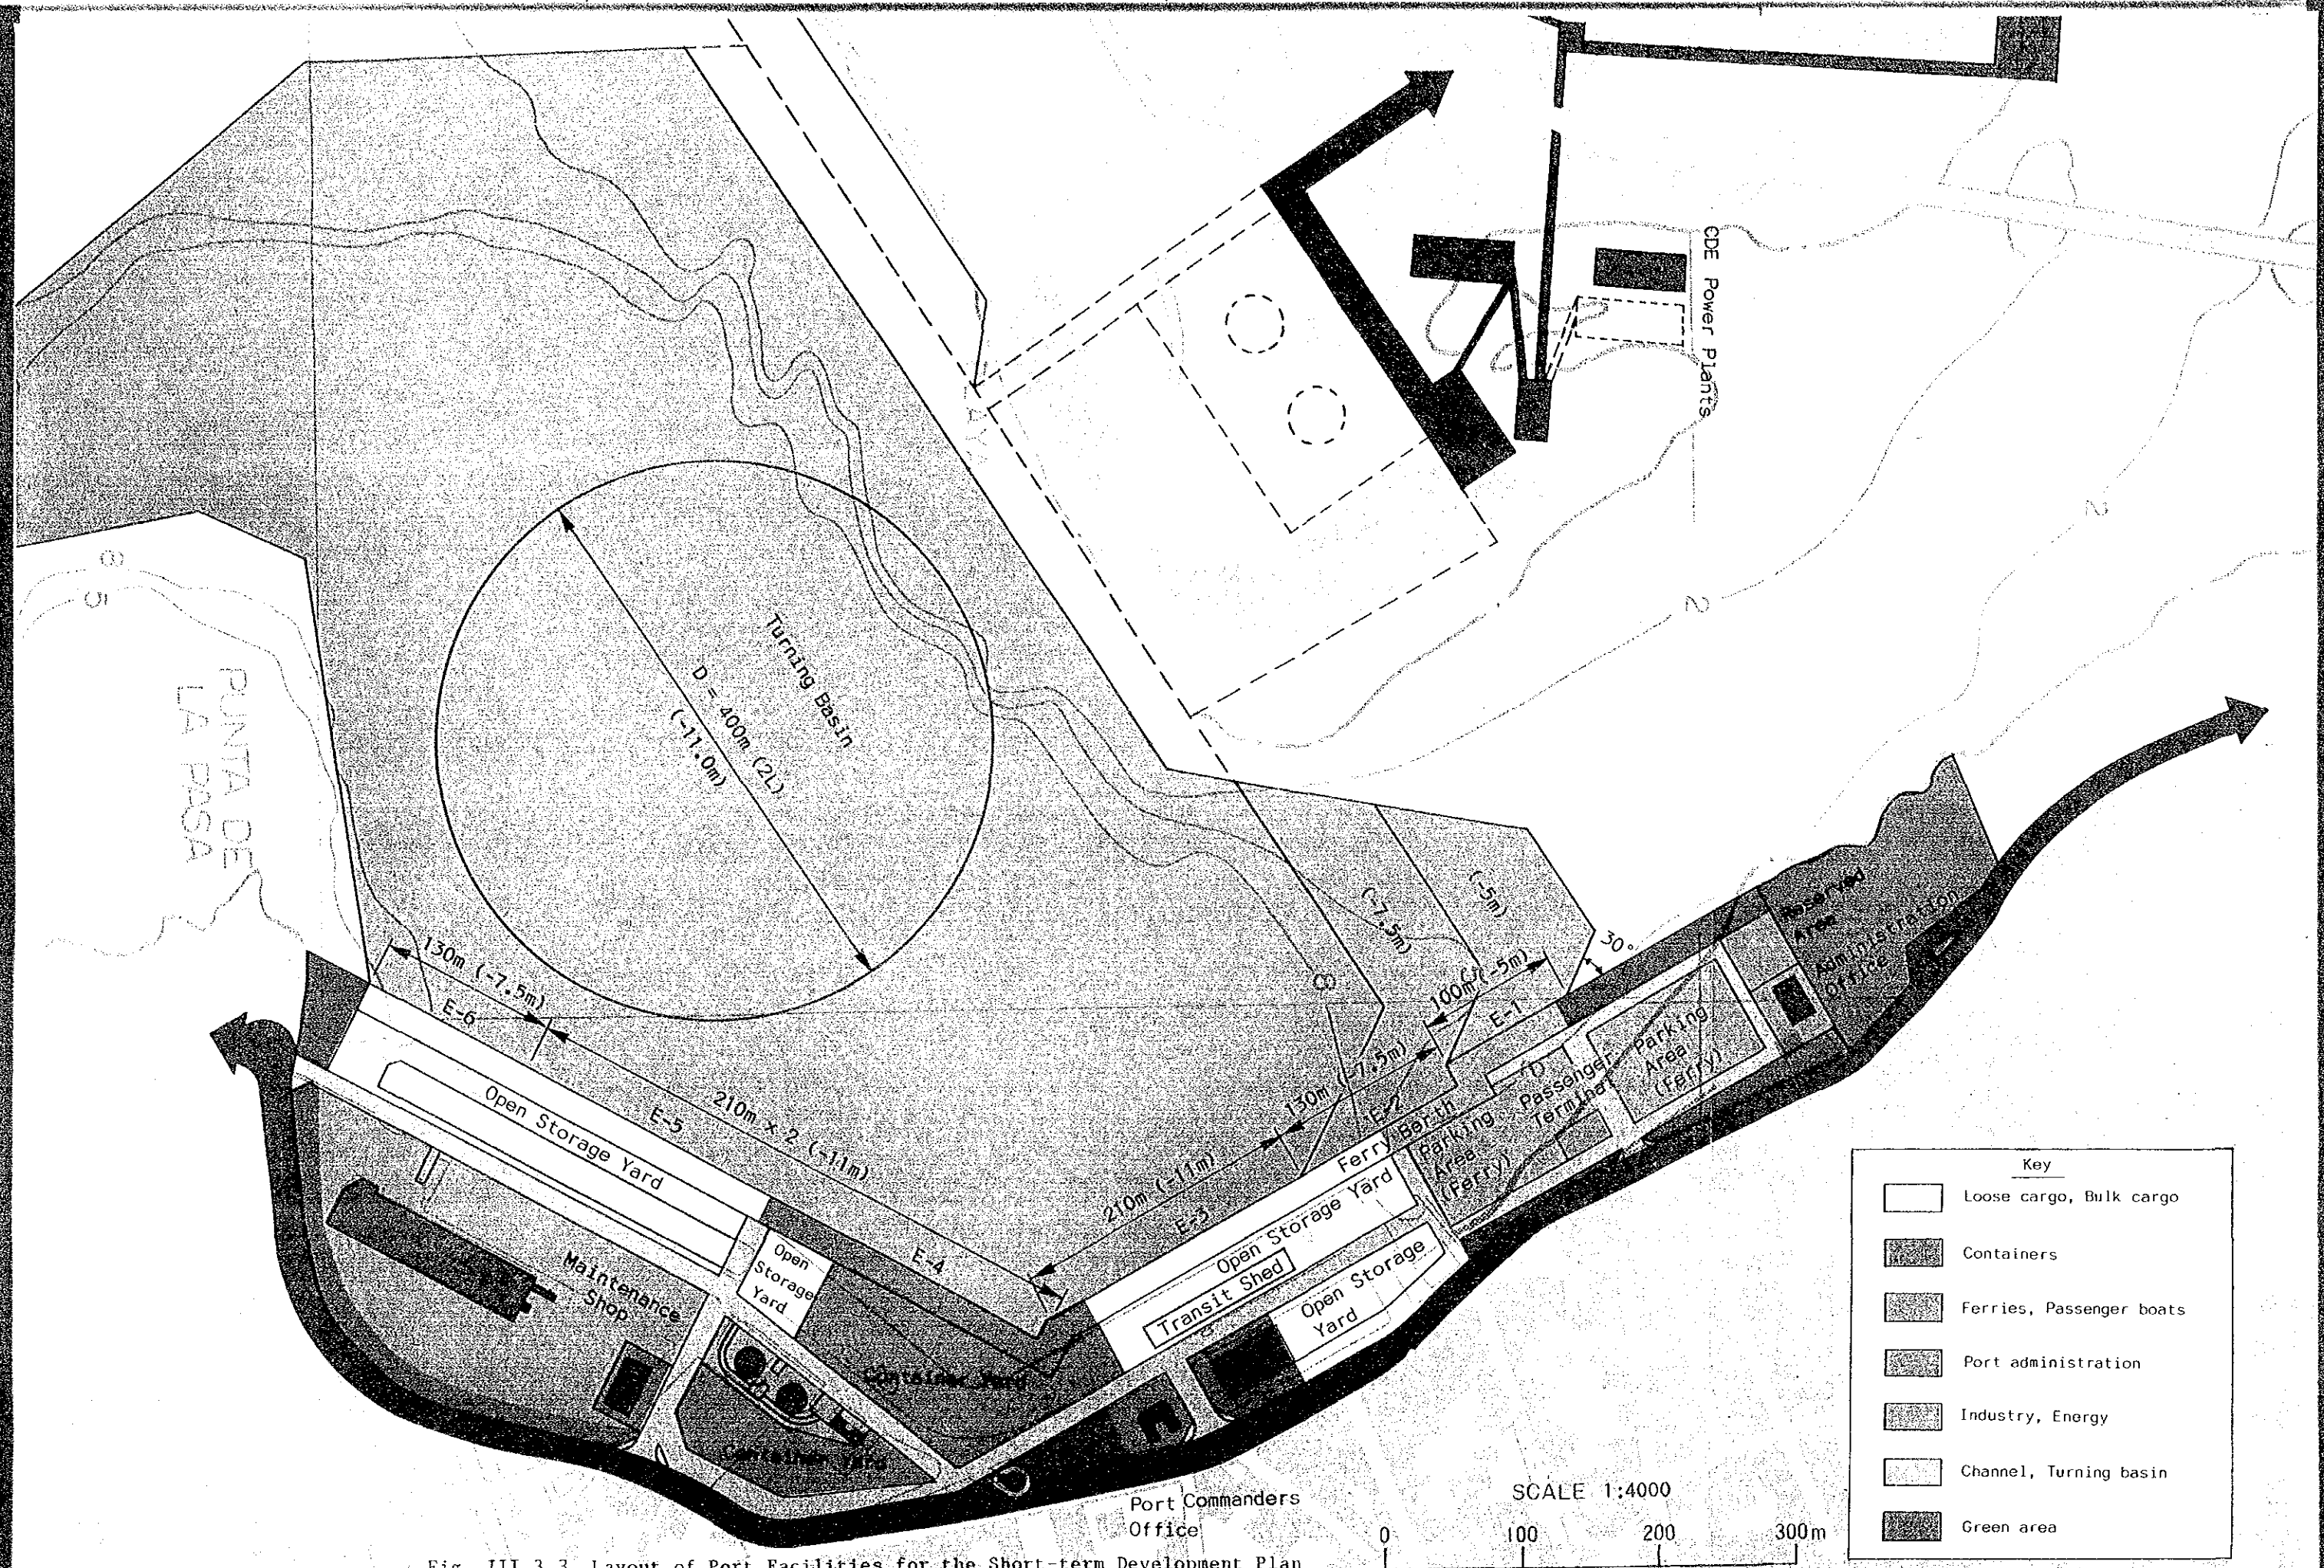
Layout of Port Facilities for the Short-term Development Plan
